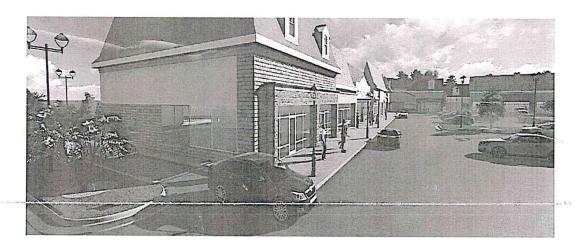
#### EXHIBIT B: CONCEPTUAL SITE PLANS
